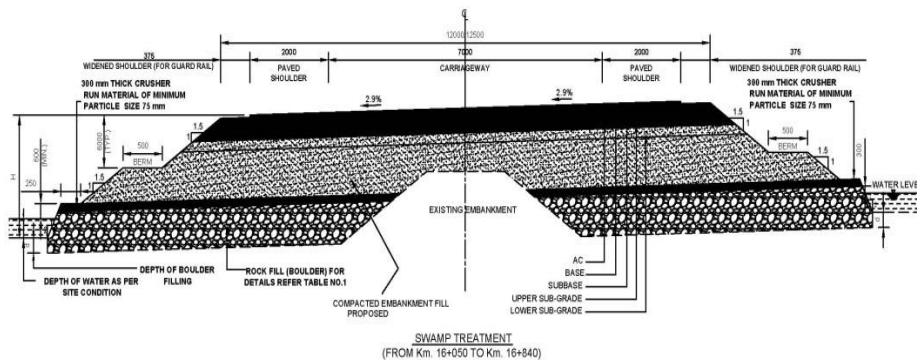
Drawing showing details of embankment with its ground treatment in swamp location along the project road
